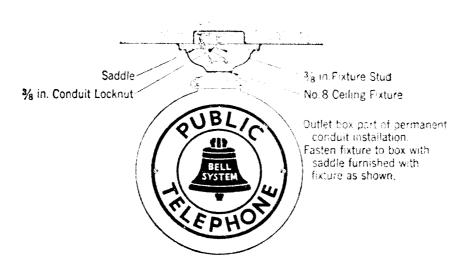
Installation of No. 8 Sign on Other Ceiling Surfaces
